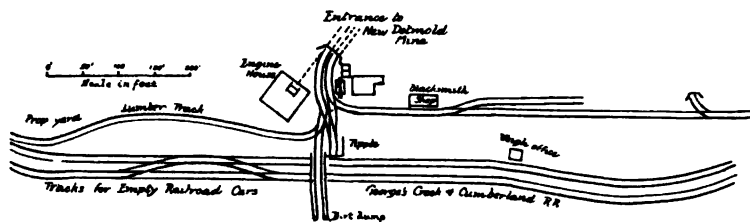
Sketch showing Track Arrangement, New Detmold Mine, Maryland Coal Company.
